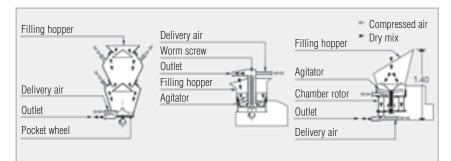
operating principles of the two-chamber type machine, the screw-type machine and the rotor-typ machine
